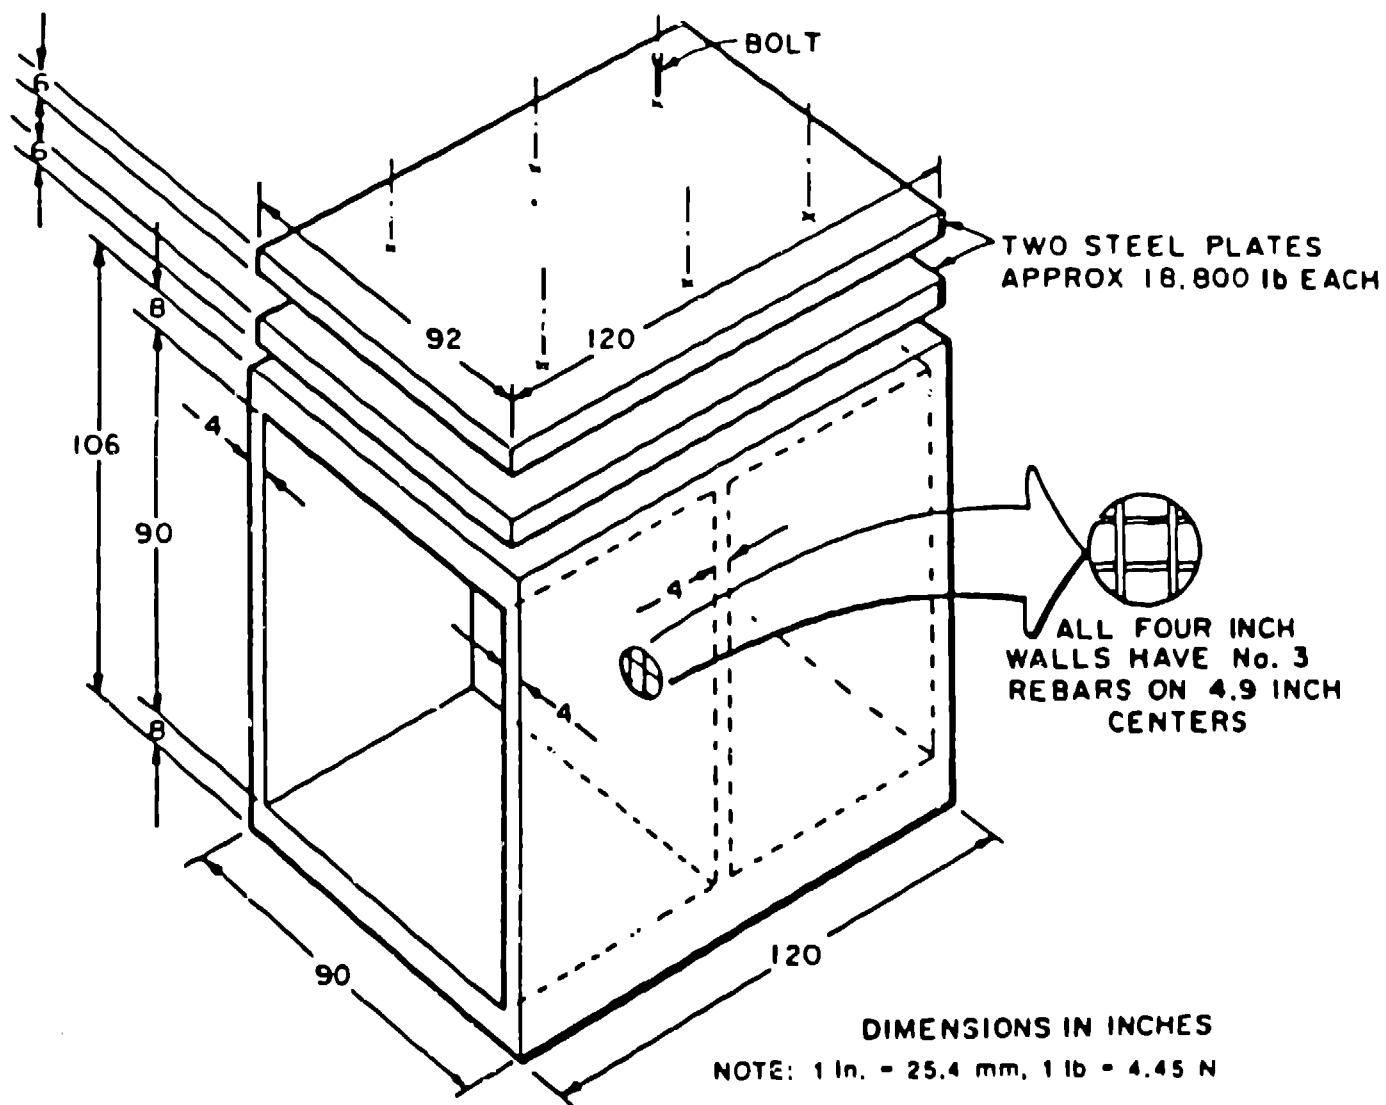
Geometry of the TRG-3 model. There is a single rebar plane in the center of each 4 inch wall.
